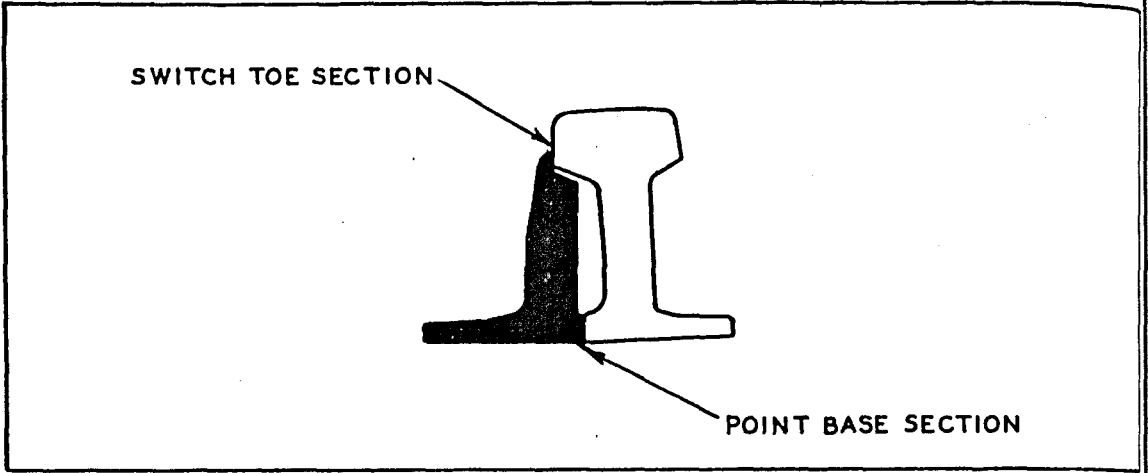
POINT BASE & SWITCH TOE SECTIONS
